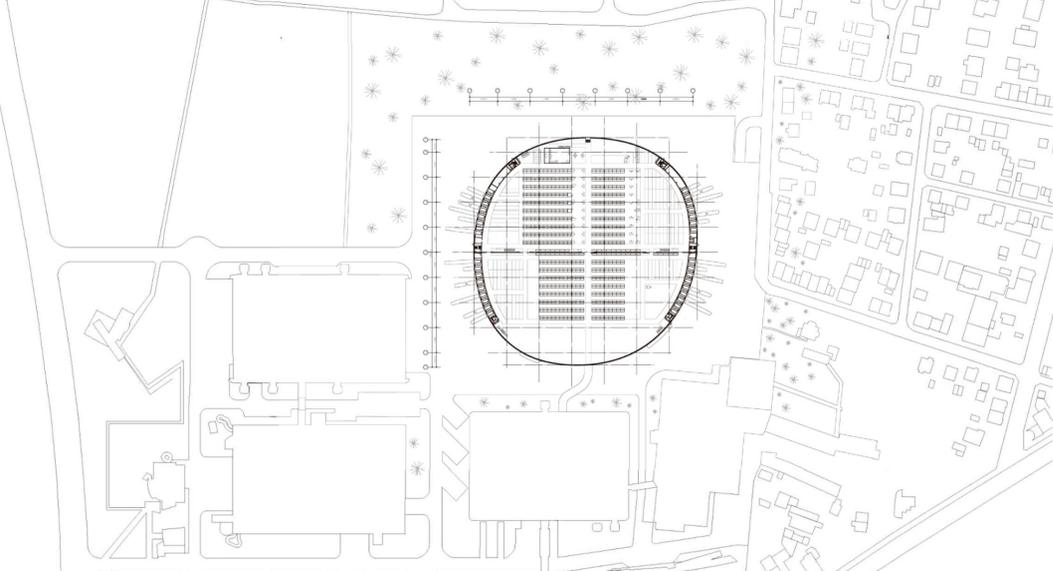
Vitra Factory Building, Weil am Rhein. Ground floor plan. SANAA, 2006–2012
